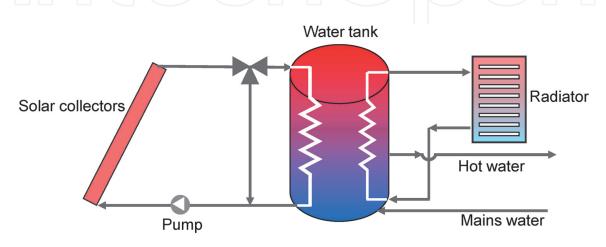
Typical layout of a solar heating system for domestic space heating and hot water.
